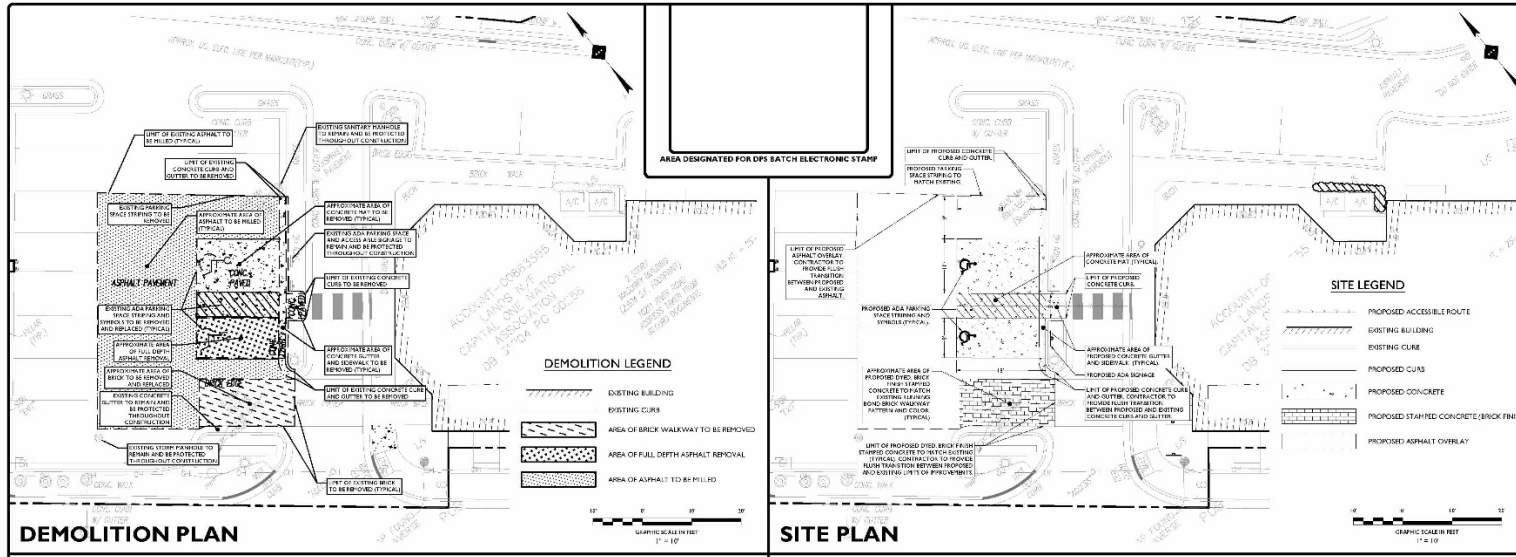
The proposed demolition plan and site plan for the parking lot improvements.
